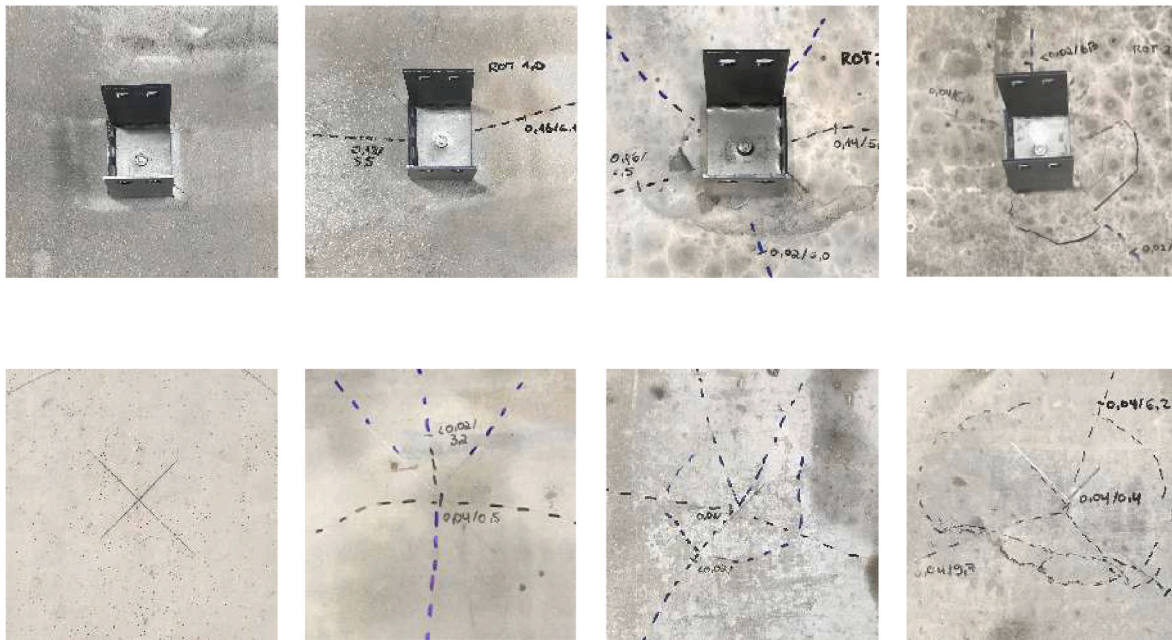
Damage images of classes 0 (left), 1 (centre-left), 2 (centre-right) and 3 (right) on both the fastening (top) and the fixture-free side (bottom).
